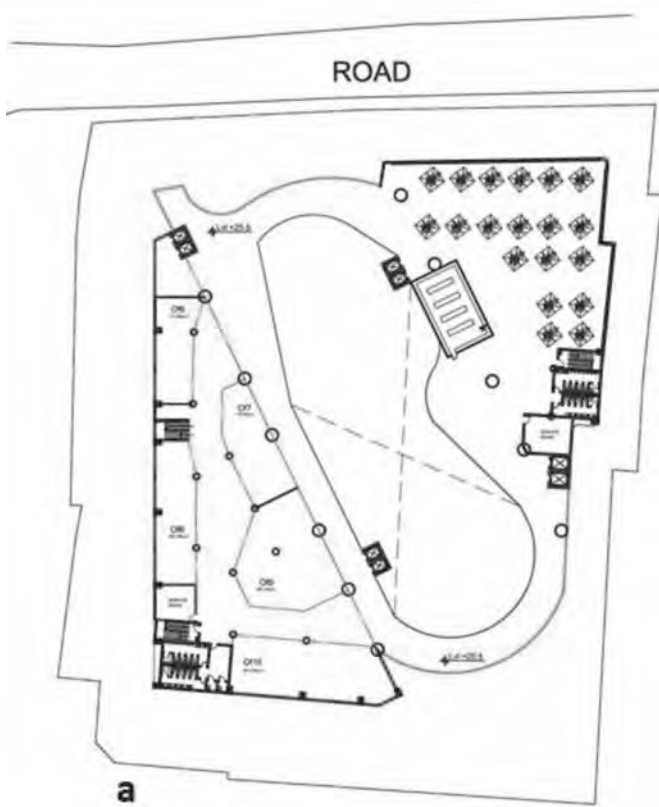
(a) Sixth floor plan showing the layout of offices and restaurants.
